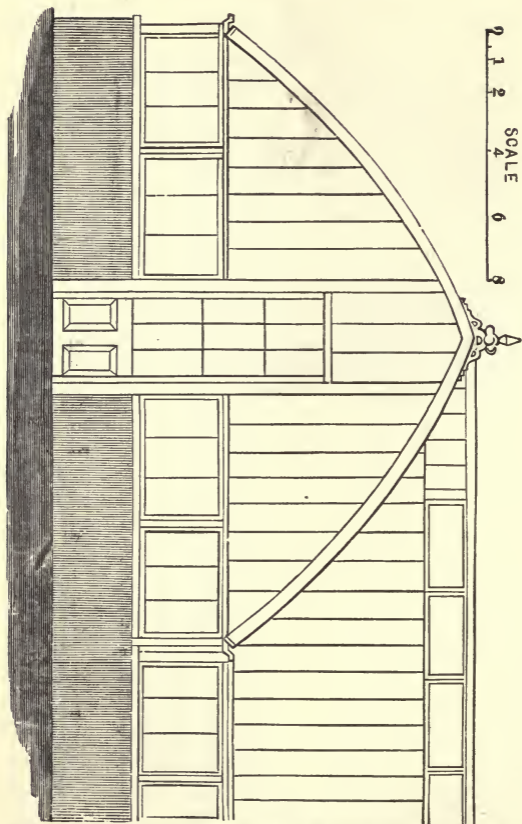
ELEVATION (IN PART) OF DETACHED GREENHOUSE OR GRAPERY.
